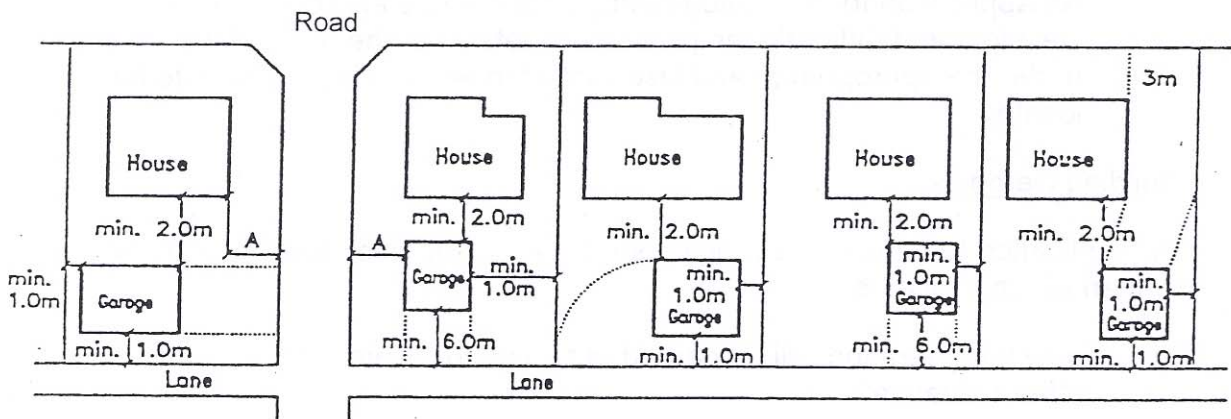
SITING OF ACCESSORY BUILDINGS
